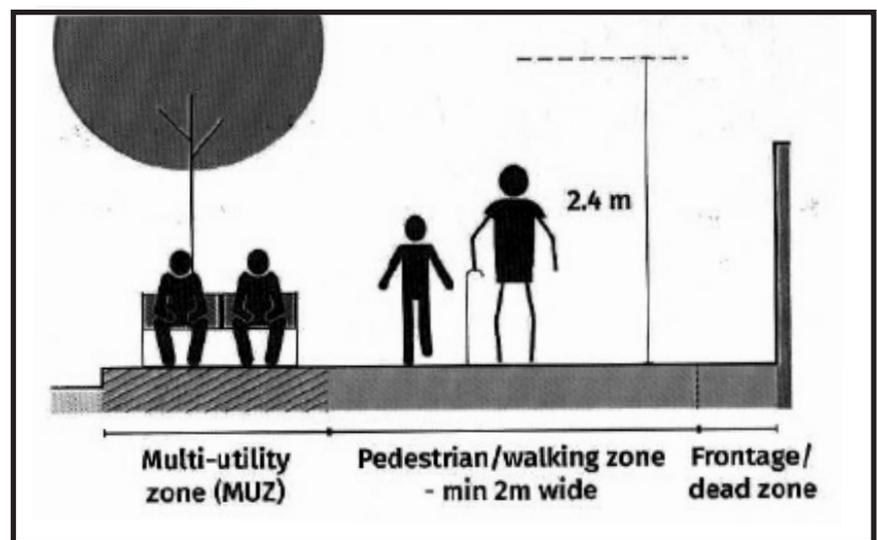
Recommended Space Requirement in Walking Zone by IRC
